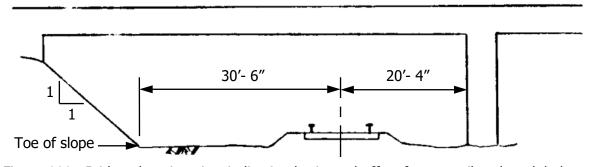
Bridge elevation view indicating horizontal offset for one railroad track below the bridge.
